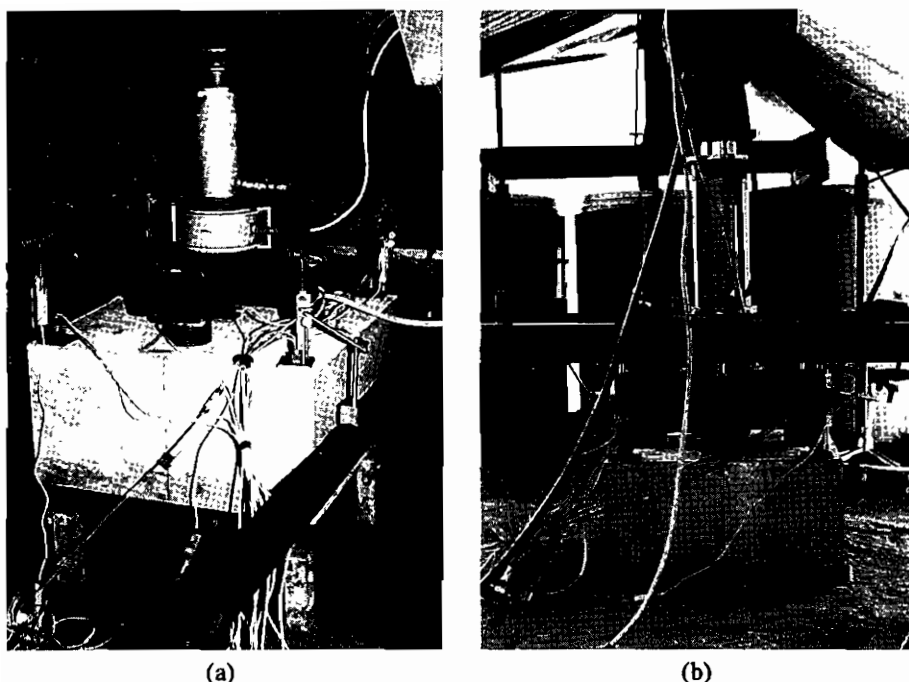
General view of arrangement of load tests: (a) Test on a free-standing pile group; (b) Test on a piled footing.
